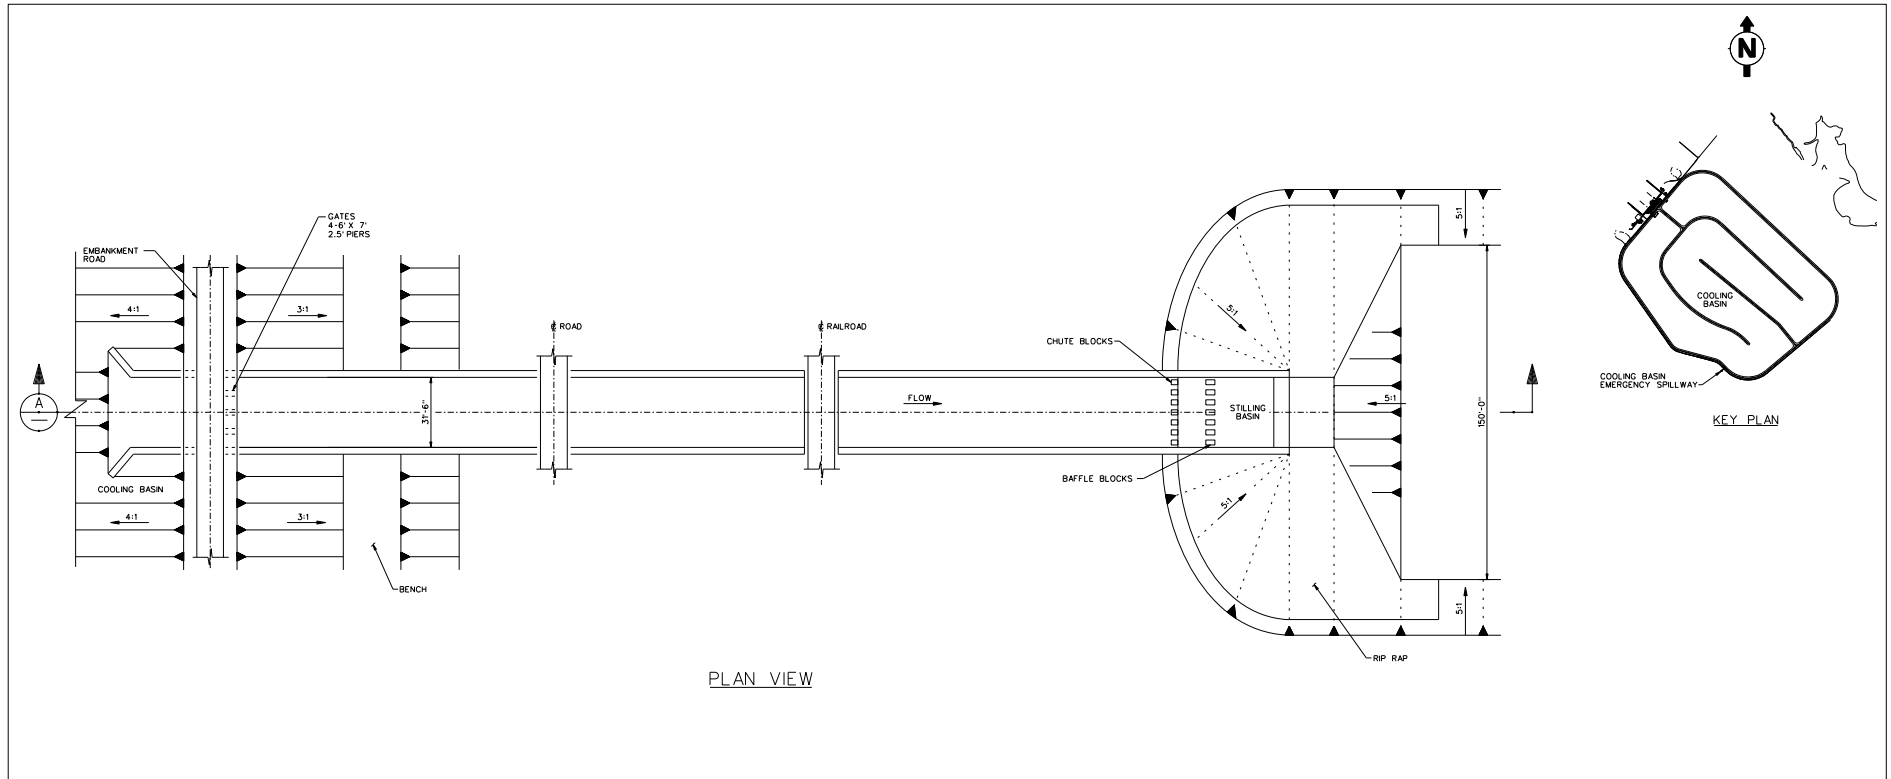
VCS Cooling Basin Emergency Spillway General Layout (Plan View) — Typical
